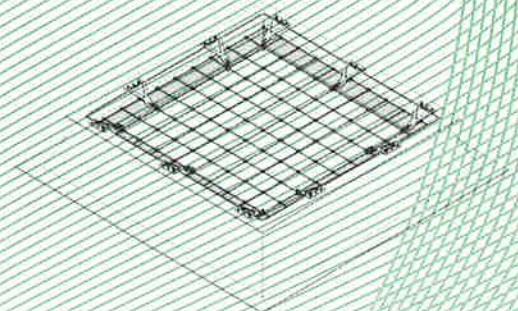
Fall-through protection, type: LIGHT-FLEX in open design
